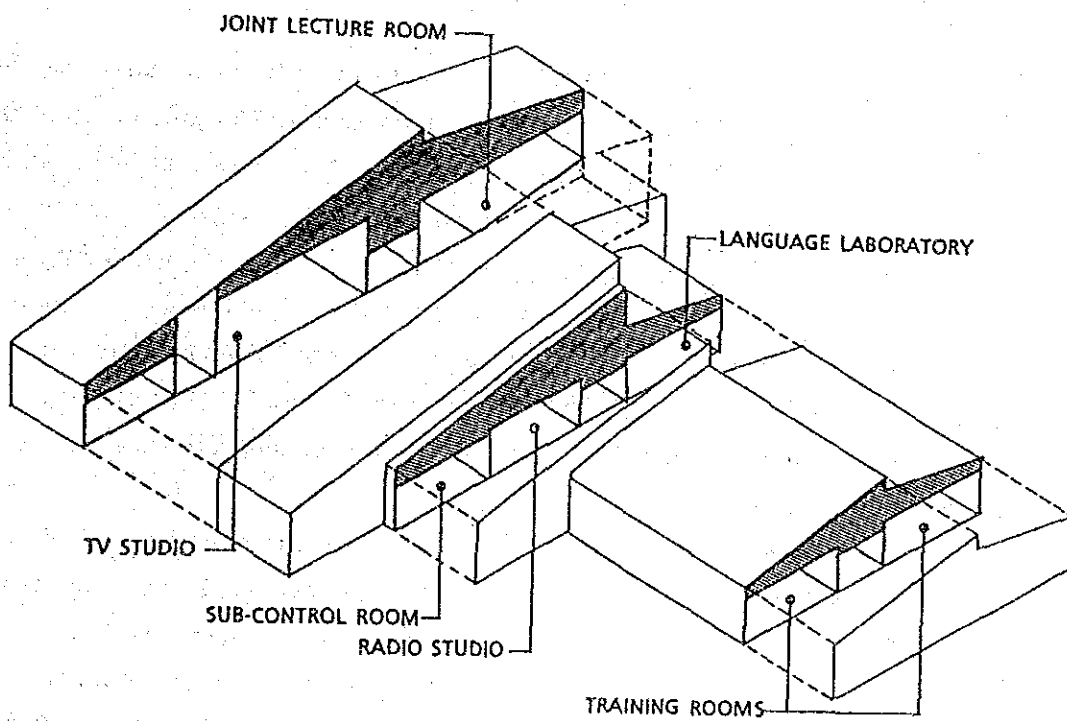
Conceptual Drawing of the Section Plan
